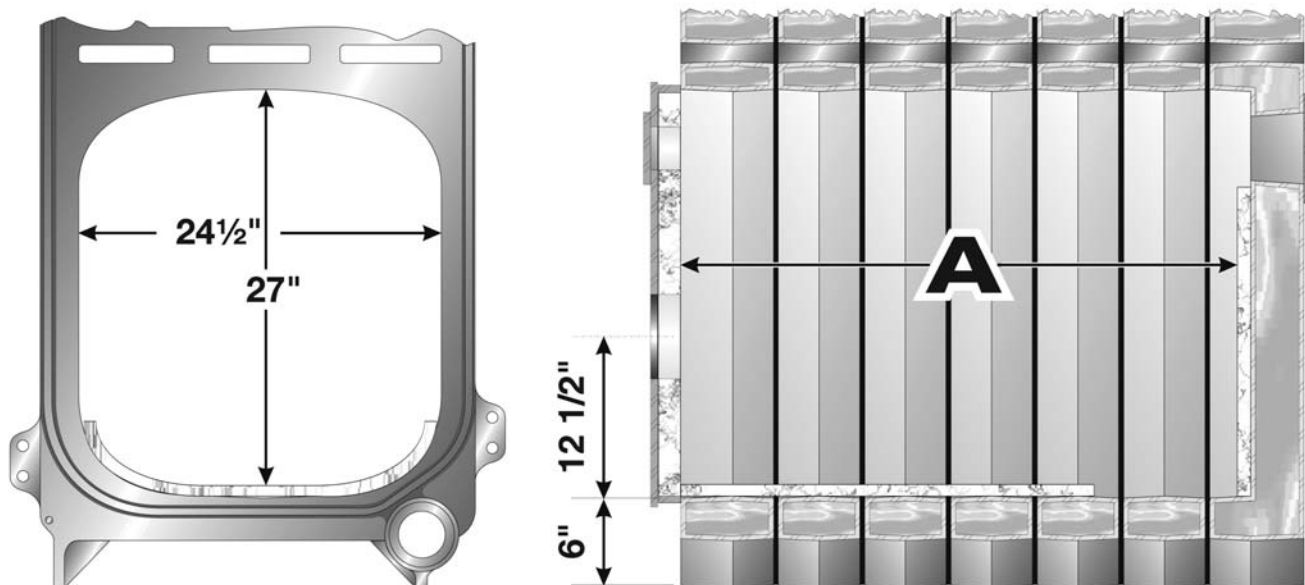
Combustion Chamber Layout – See Table 6.1 for Dimensions
